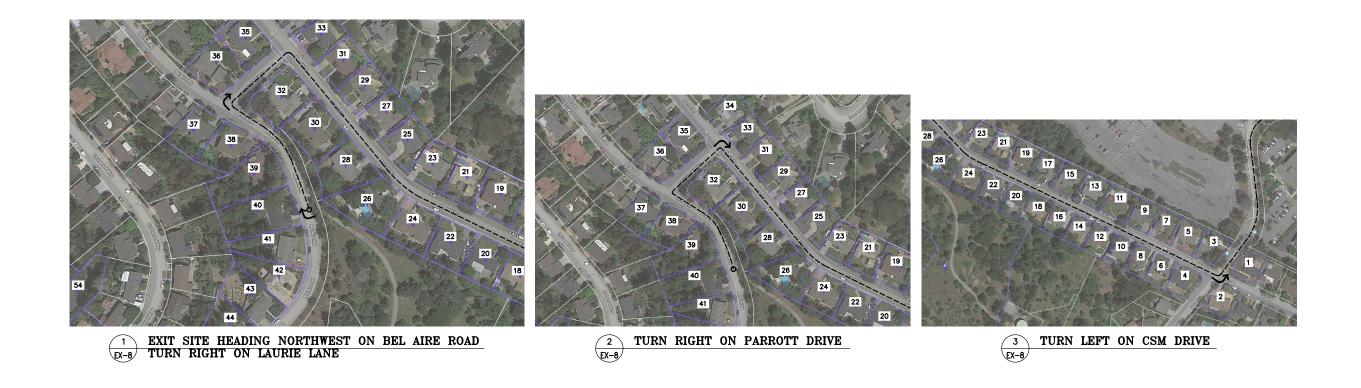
TRUCK HAUL ROUTE FROM SITE DIRECTIONS
